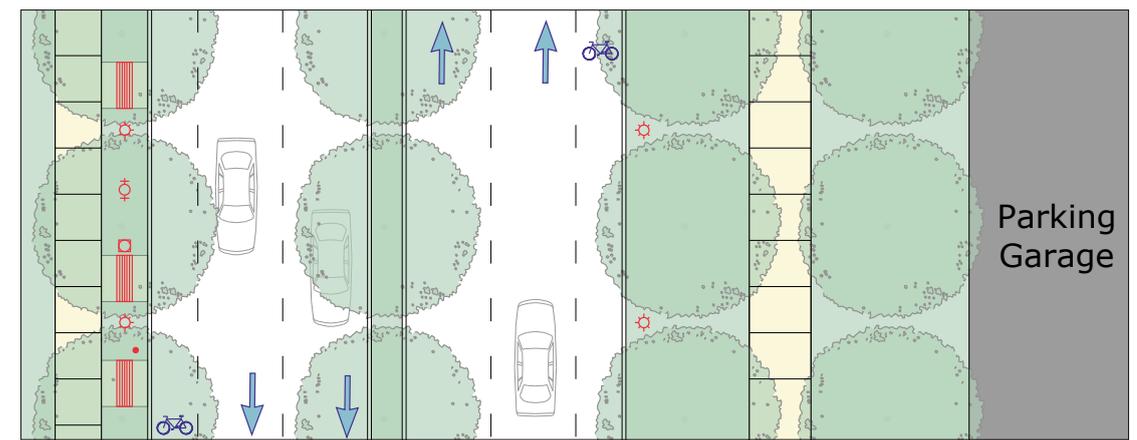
Proposed Canyon Crest Drive at Bannockburn Village Plan Diagram
